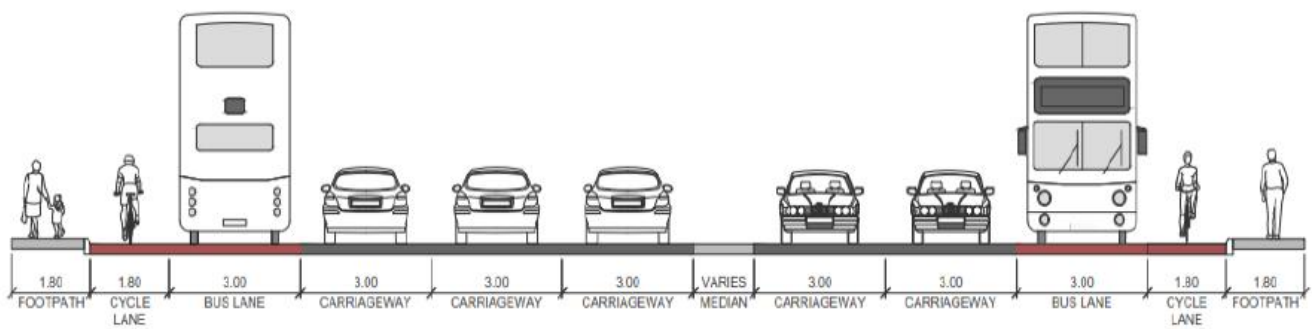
EPR Cross-Section Immediately South of Anglesea Bridge (Looking North / Inbound)
